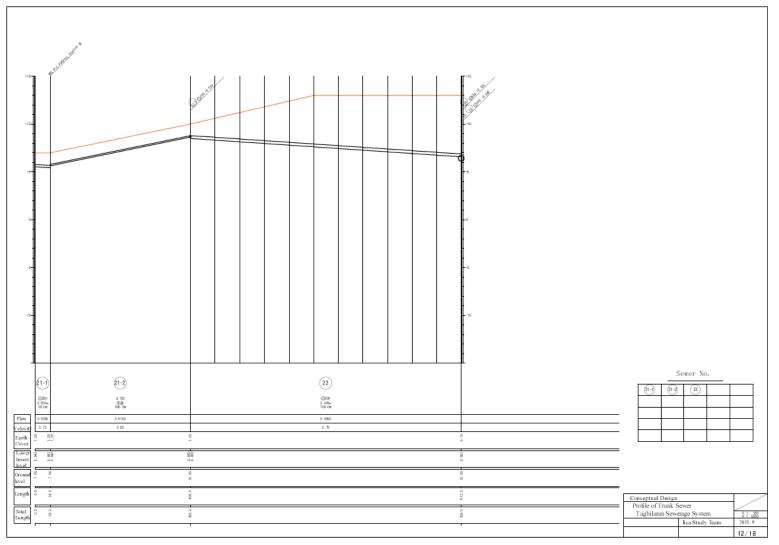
Profile of Trunk Sewer (Tagbilaran Sewerage System)
